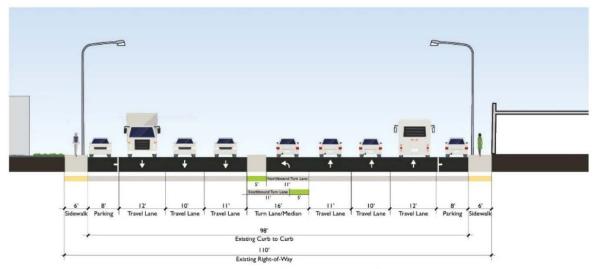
Existing Conditions Cross-section - Shields Avenue to Hedges Avenue (facing North)
